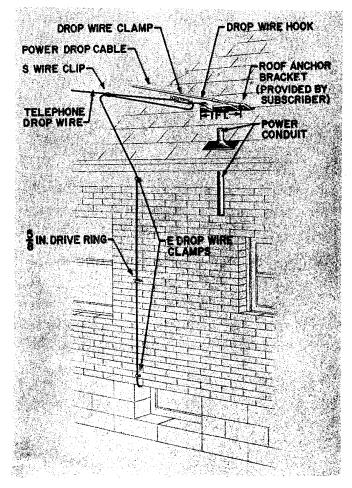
Drop Wire and Power Cable Attached to Roof Anchor Bracket
